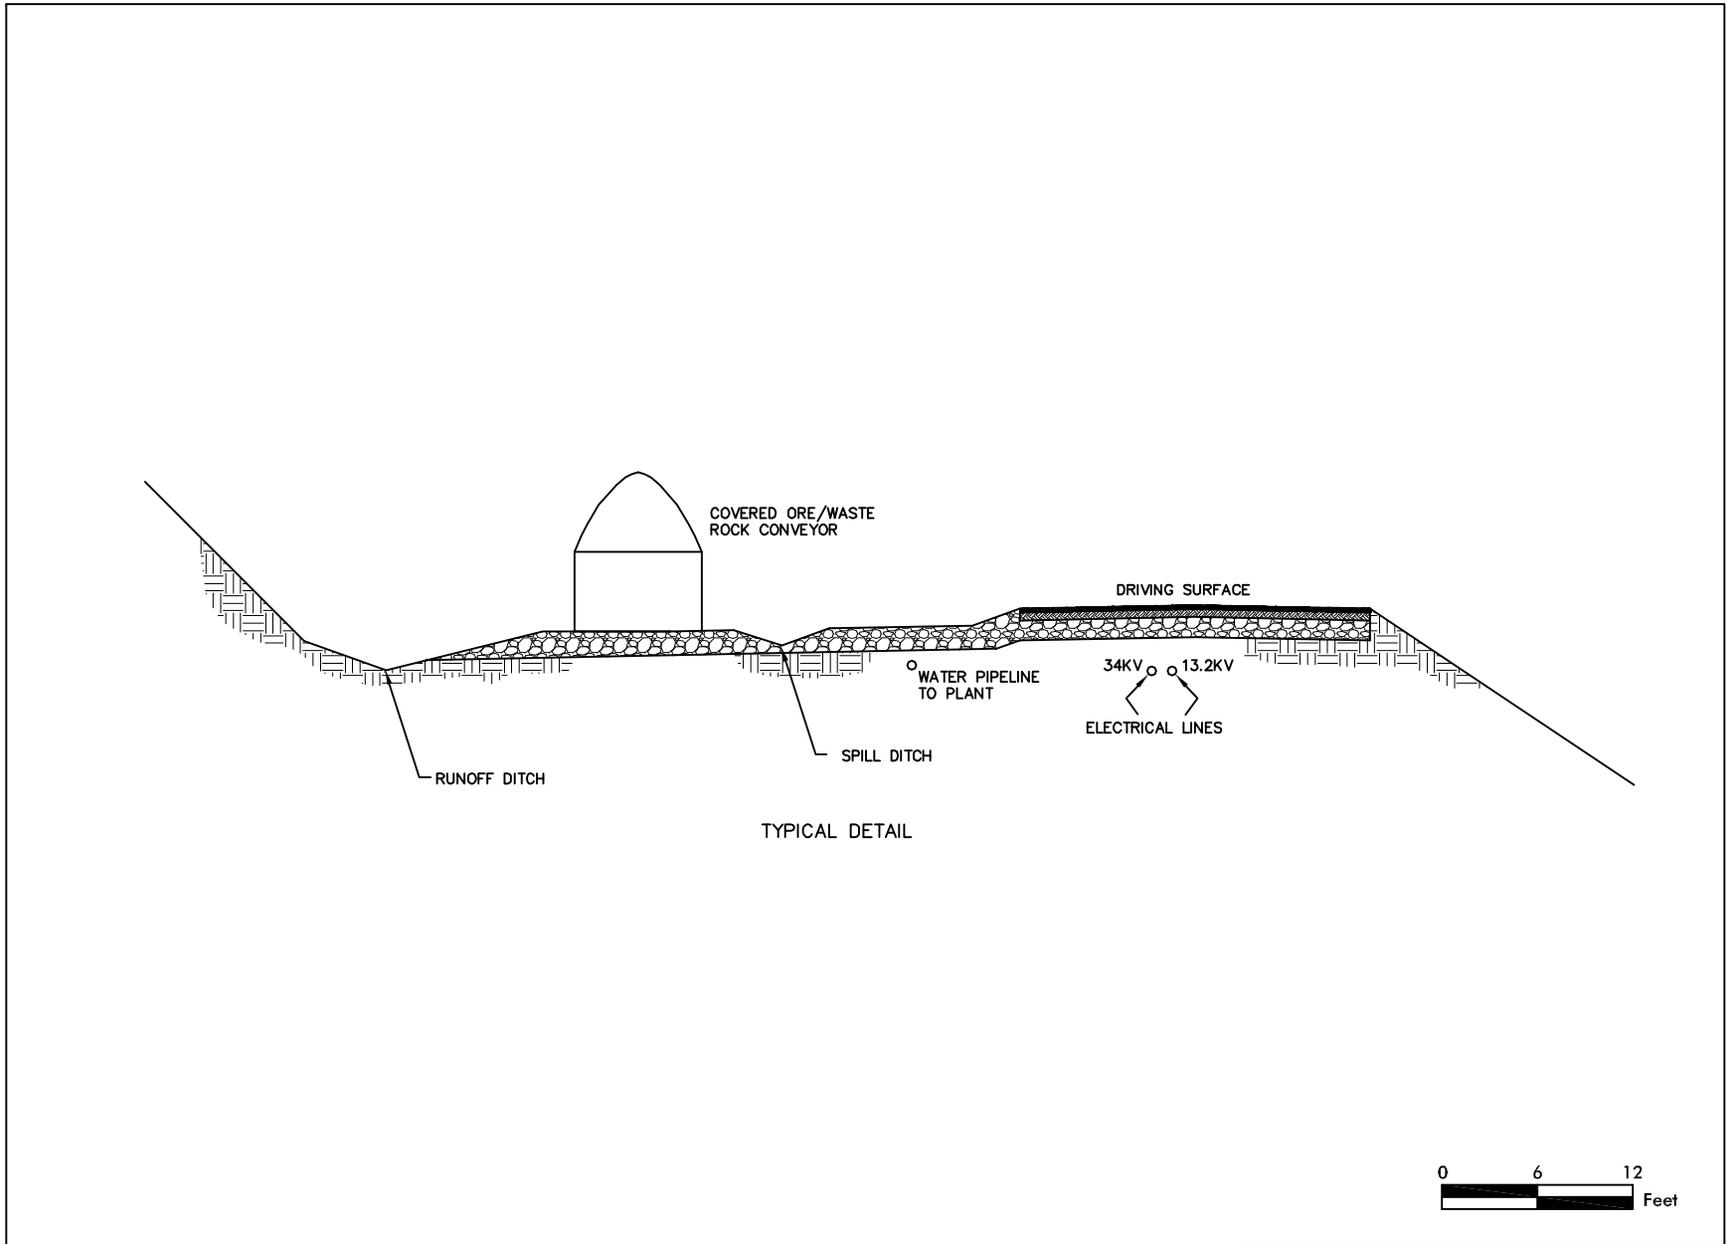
Detail of Overland Conveyor and Libby Adit Access Road, Alternatives 3 and 4
